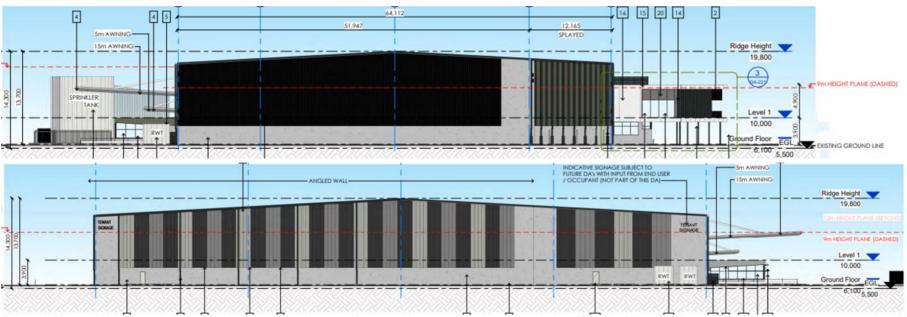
Proposed height variations with Lot 4 western elevation above and Lot 1 southern elevation below (Source: Pace Architects)
